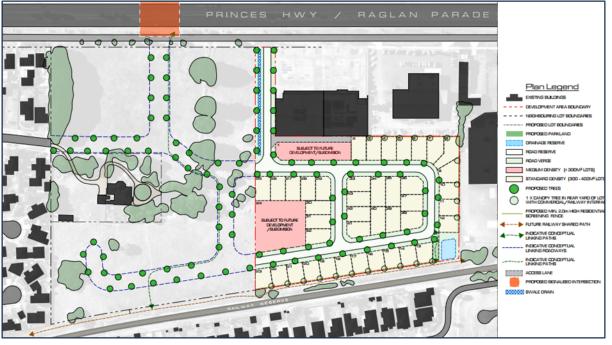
Proposed Urban Design Master Plan (source: application documents)
